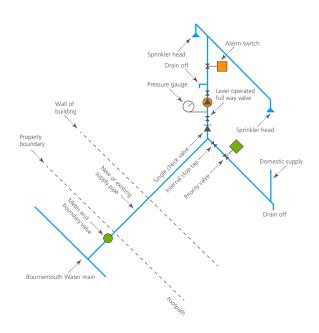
Mains Fed Sprinkler Installation via a Single Metered Connection
